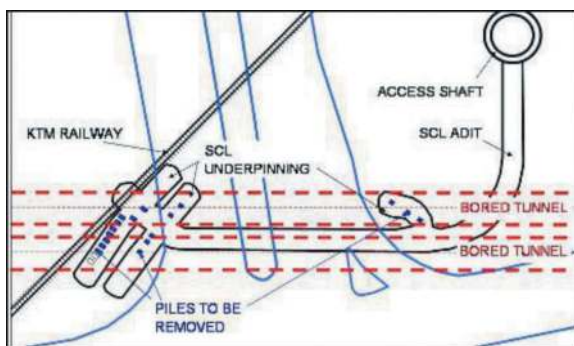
Plan view of the temporary SCL tunnel/shaft.
